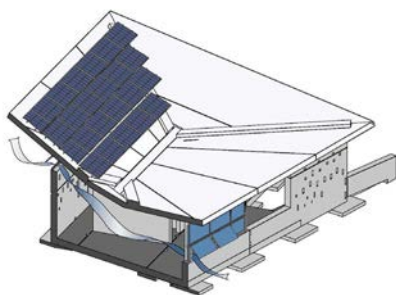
Passive Optimization – Cross Ventilation: the depressed roof angles made possible by the inverted-hip roof and operable windows (low on the south façade and high on the north façade) allow excess heat to flow out of the house.
